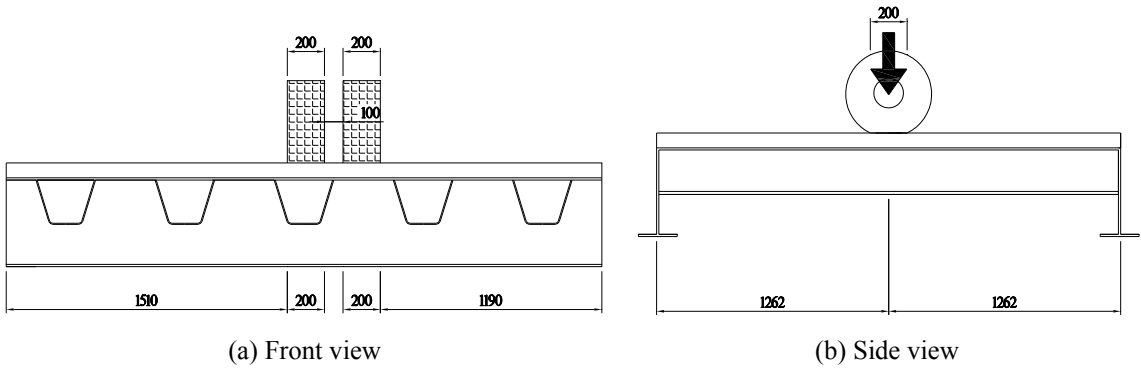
Loading conditions of the orthotropic steel deck (unit : mm)
